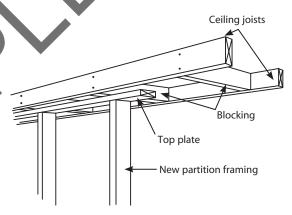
Blocking between joists to which the top plate of a new partition is nailed
